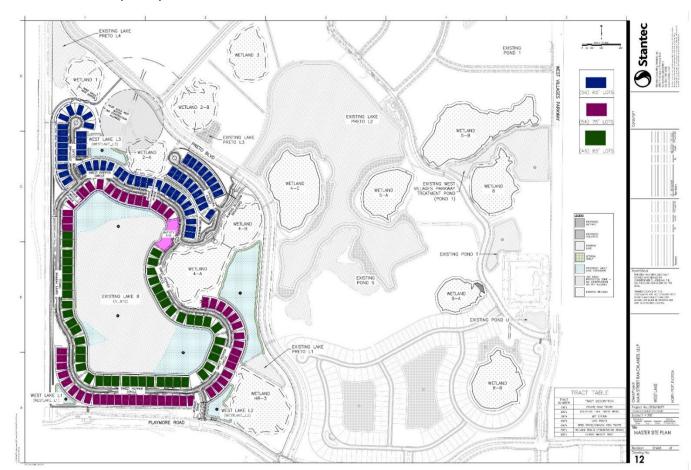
Proposed Preliminary Subdivision Plat, West Lake.
